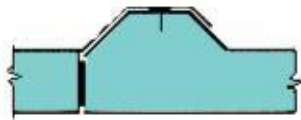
SIDE LAP JOINTS - OVER 4°
